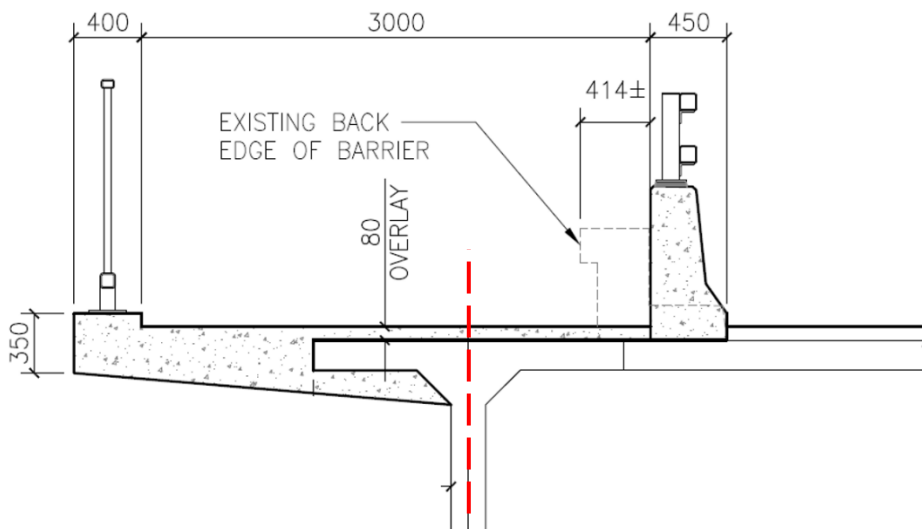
Cross Section of Proposed Walkway (3.0 m wide)
